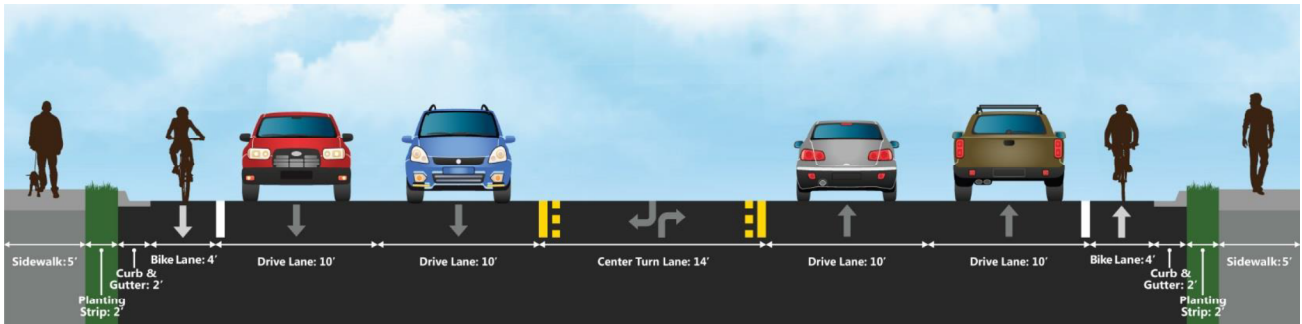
SR 40 from John Anderson Drive to Halifax Drive Typical Section
